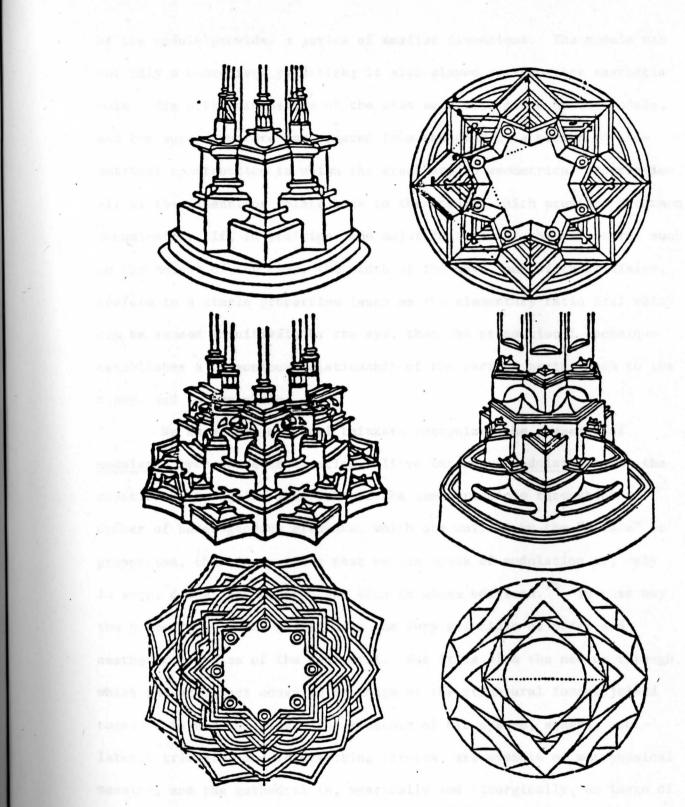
Ground plans and elevations of Gothic canopy supports.
